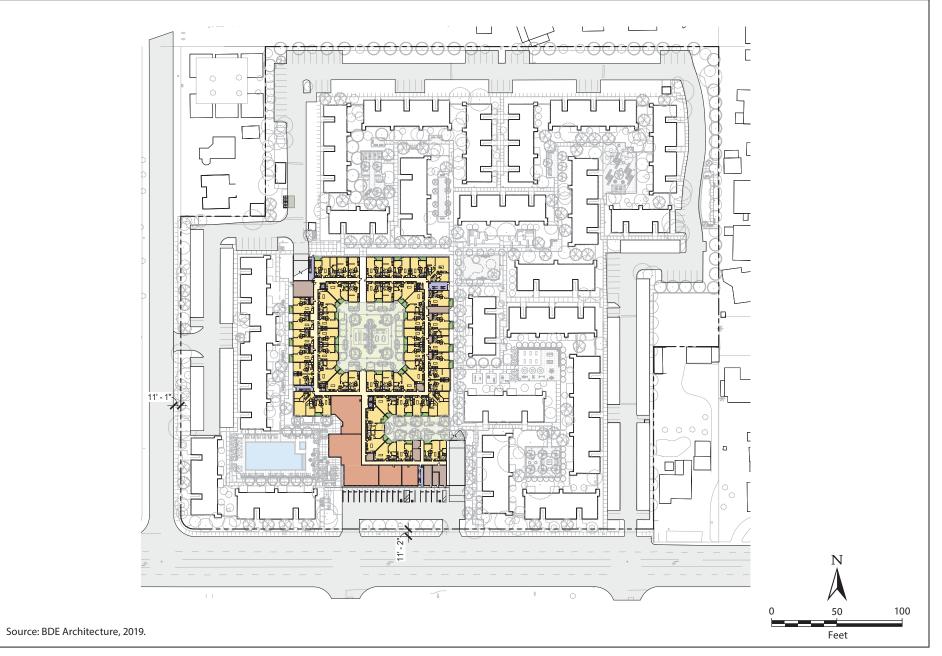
Proposed Site Plan Laguna Clara II Project
